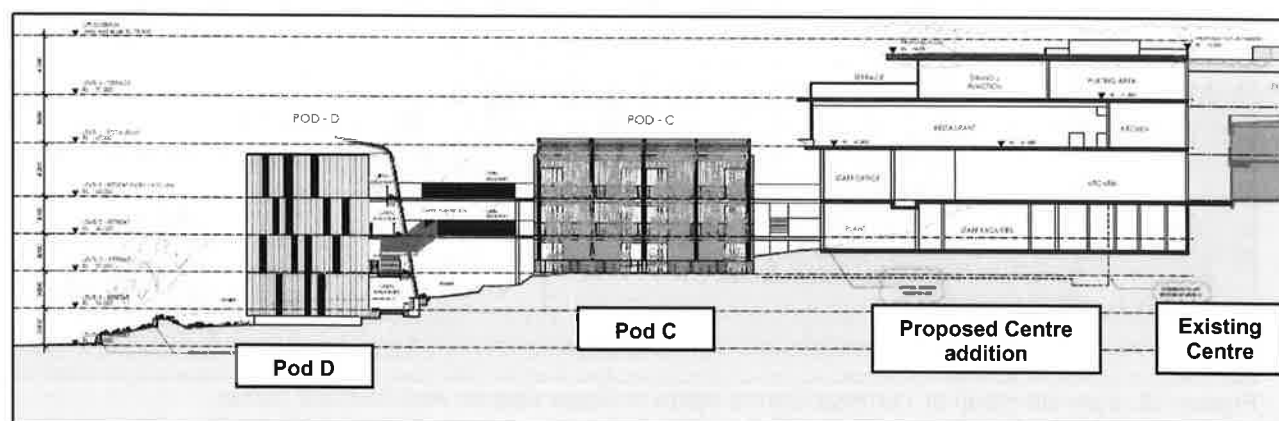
Section of proposed Taronga Centre addition and pods C and D (Base source: Architectural Plans)
